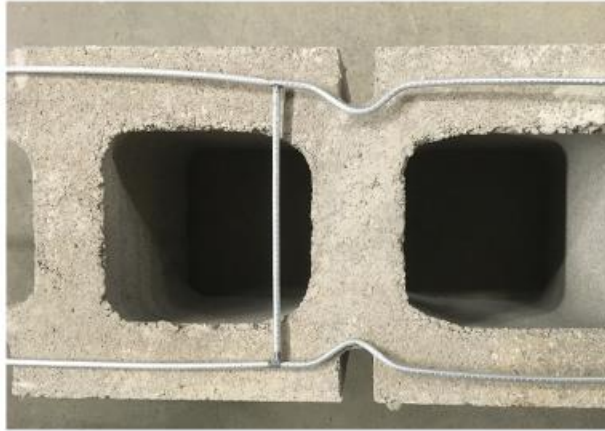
Deformed joint reinforcement ladder for SRCMU construction
